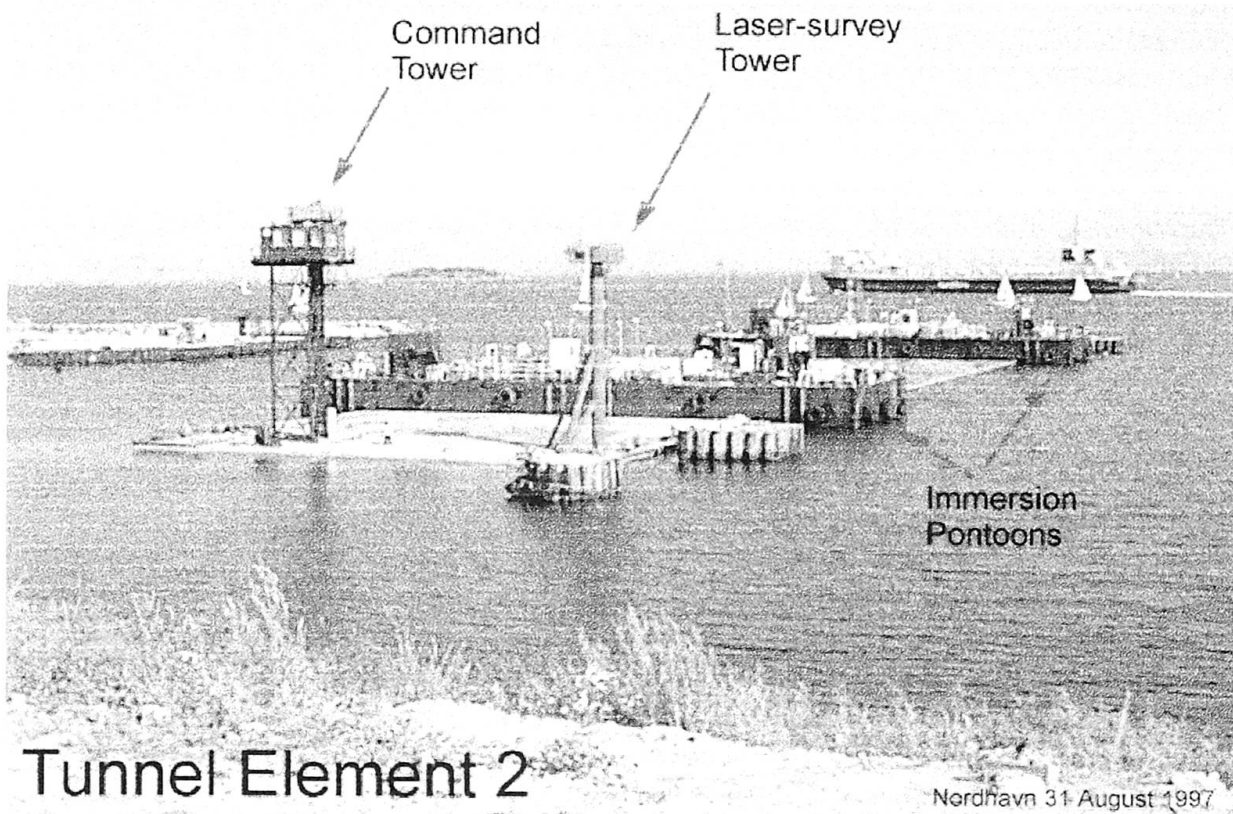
Tunnel element moored at production facility north of Copenhagen, ready for towing to construction site for immersion
